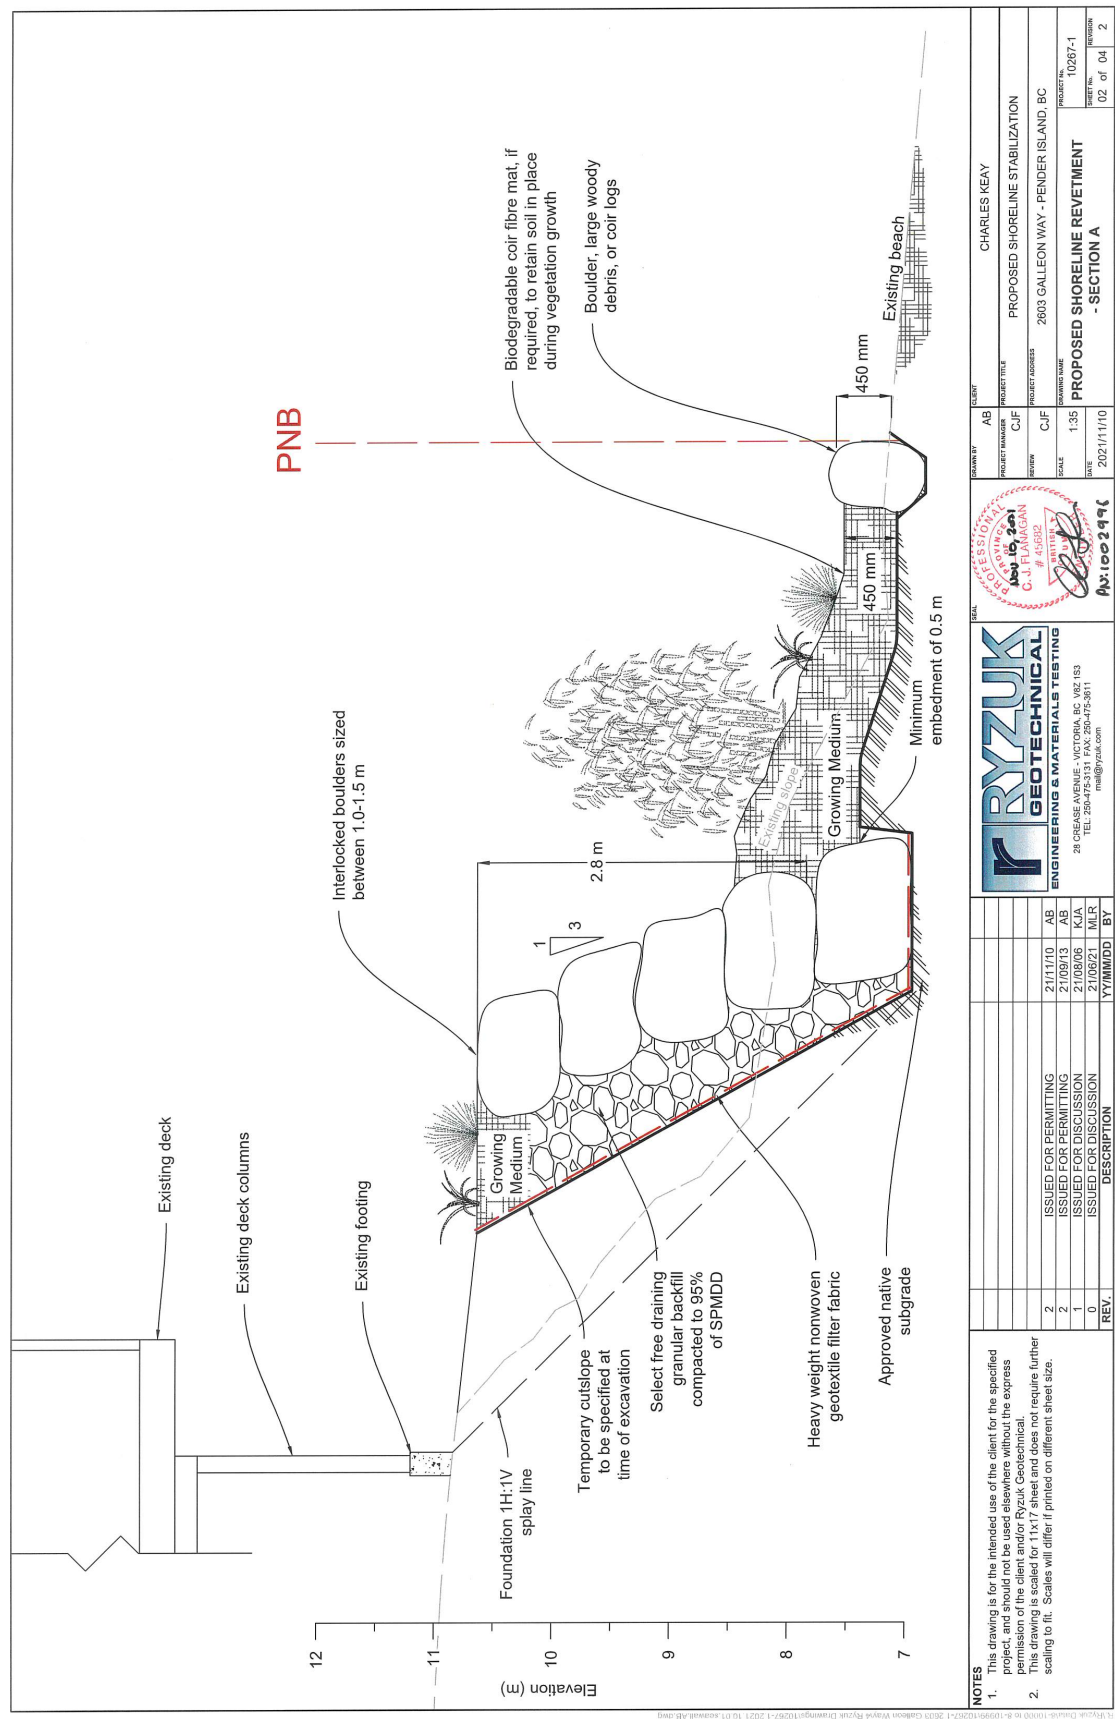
Section A – Shoreline stabilization and planting area adjacent to the house.
